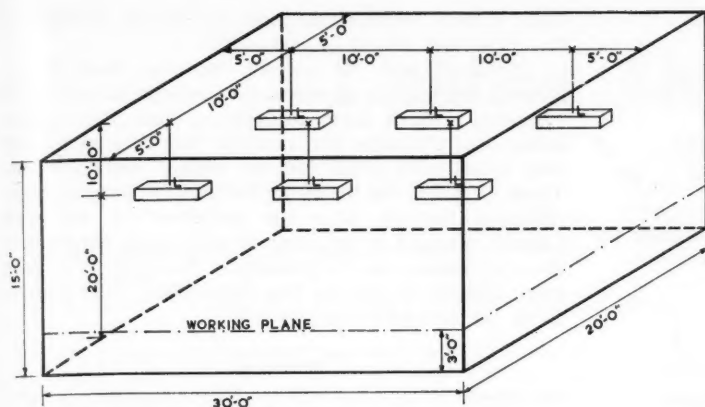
Sketch of room used in the example, showing mounting and spacing of luminaires.
